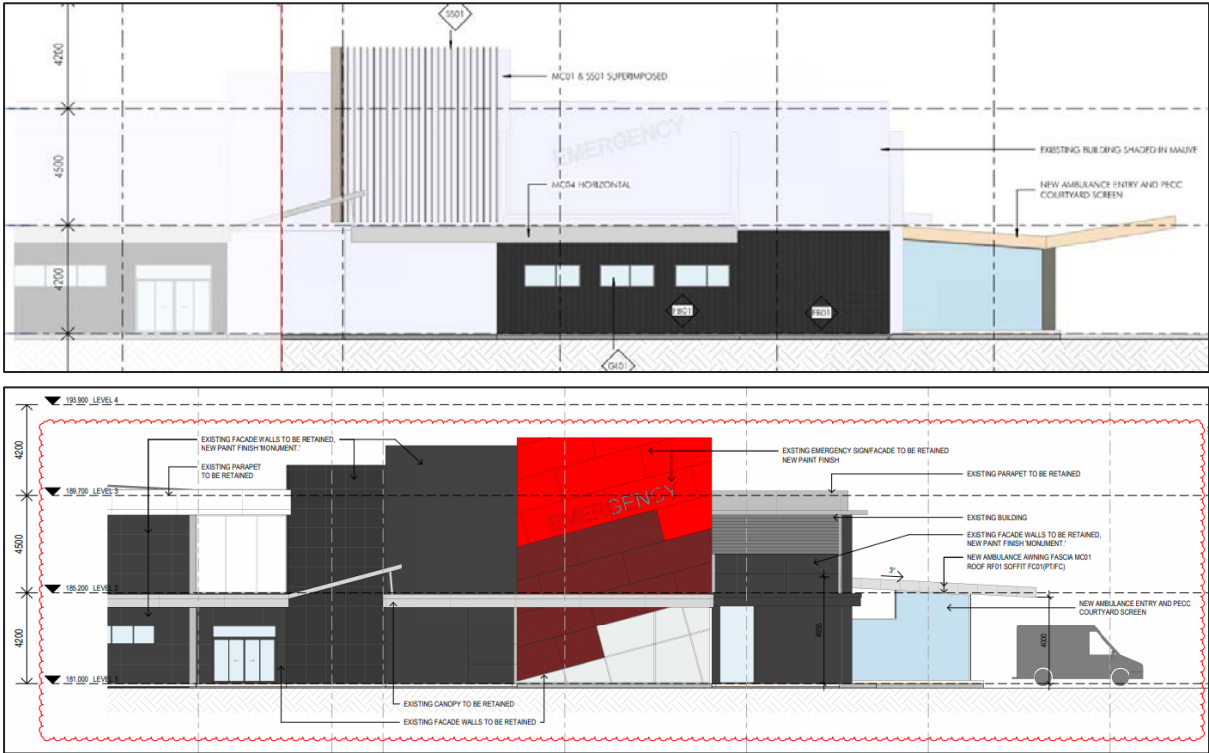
| Approved western elevation (ED) (above) and proposed western elevation (ED) (below) (Source: SSD 8647 Approved Plans and Applicant’s Modification Report)
